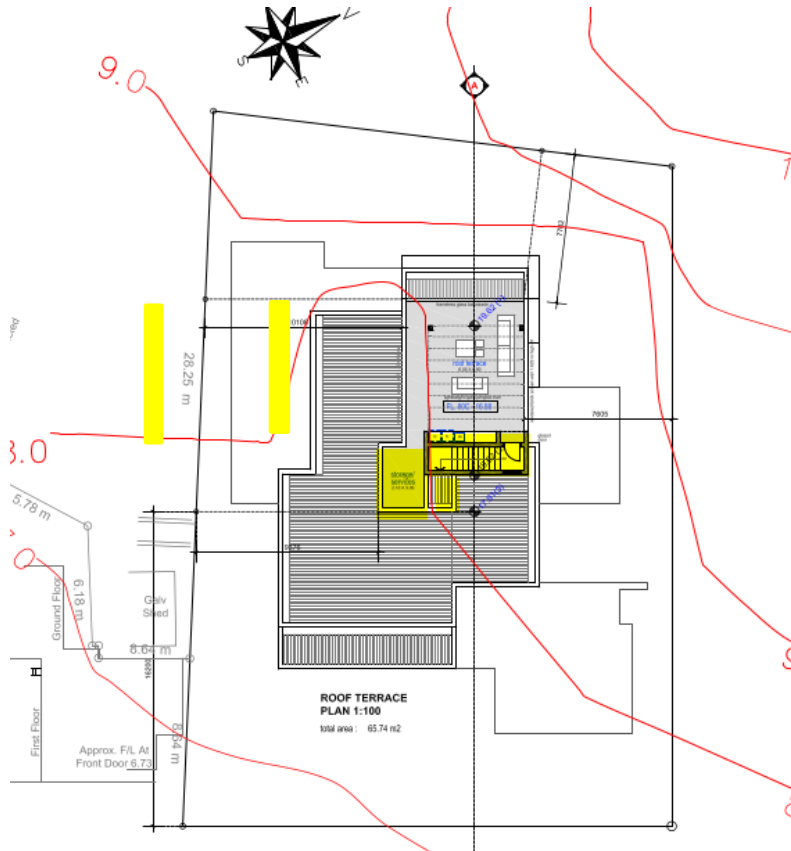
Yellow highlight showing enclosed area of the roof terrace above permitted height
